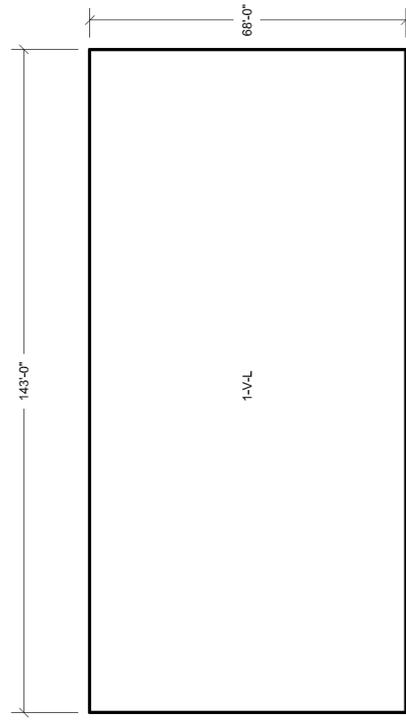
H.6.6.1 PUMP HOUSE NORTH WALL LOCKING SOUTH
